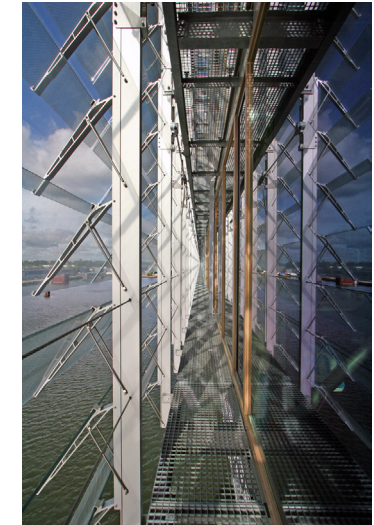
Double glazing panels with louvres of Kraanspoor building (Archdaily, 2008).
